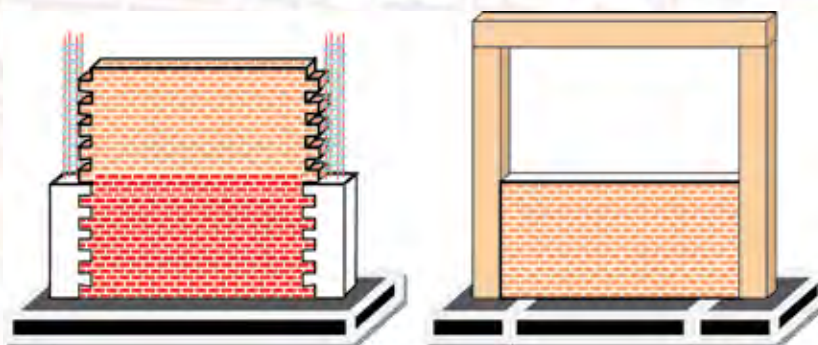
Sequence of construction for Confined masonry (left) and RC frame (right)
